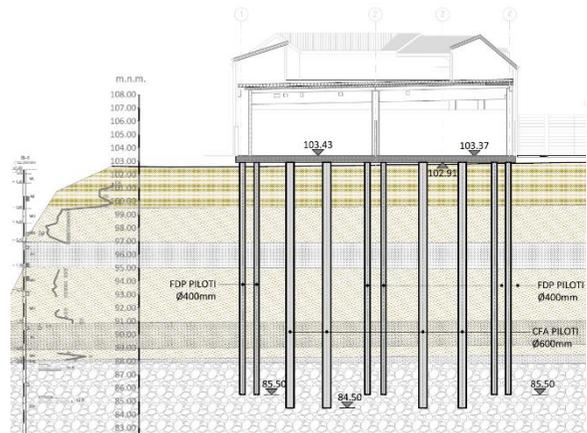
Schematic view of the mounted reinforced structure and foundation system: reinforced concrete slab with FDP and CFA piles
